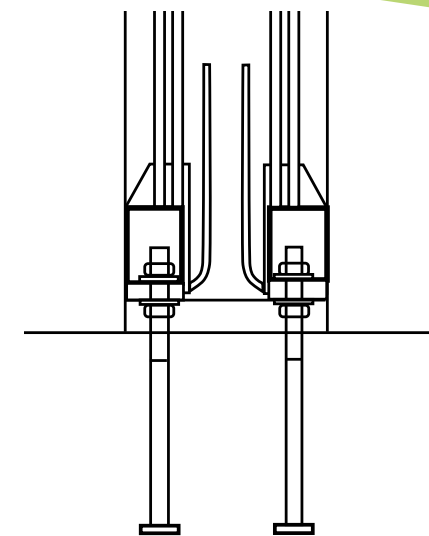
BOLTED PRECAST COLUMN CONNECTION WITH HIGHLIGHTED RECESS BOXES
